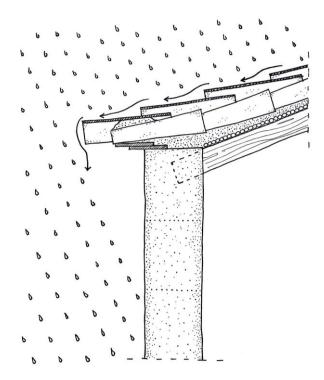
Protection from the rain through sloping roof and wide eaves. Source: L. Balaguer
